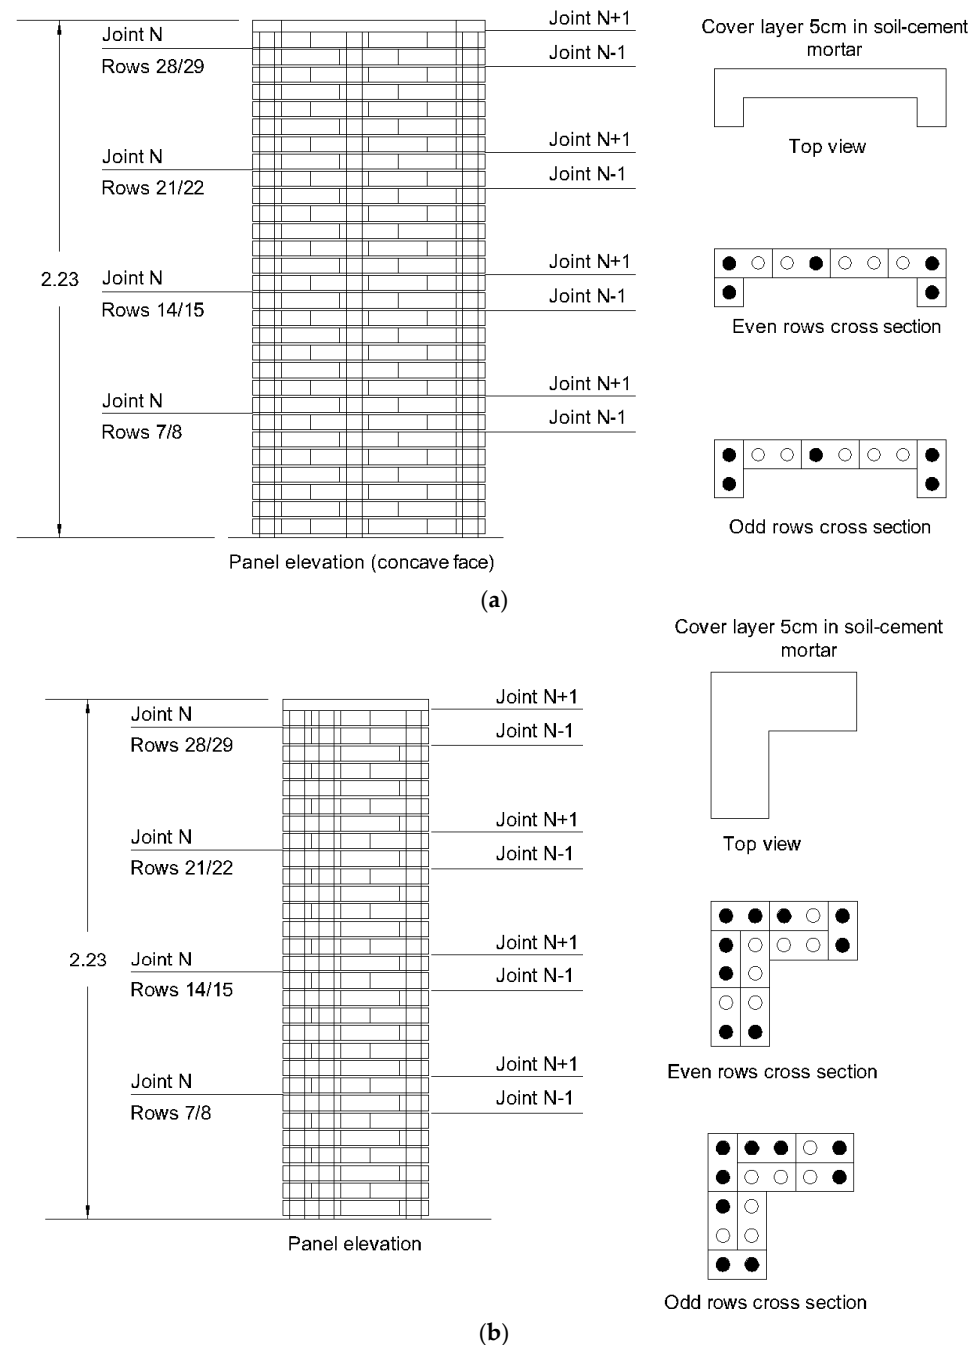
Preliminary version of SHS-Multirisk 2.0 house panels: (a) C panel elevation and cross sections; (b) L panel elevation and cross sections.
